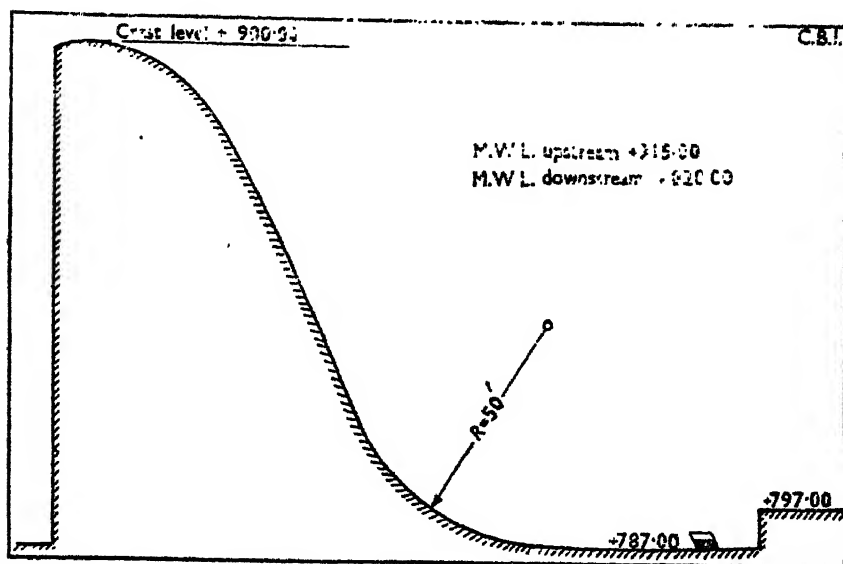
C.15 : Showing 15 feet overflow section of Lower Bhavani Spillway dam.
